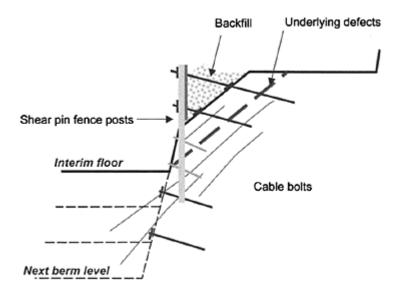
Ramp recovery and batter reinforcement using shear pin fence and cable bolts.
